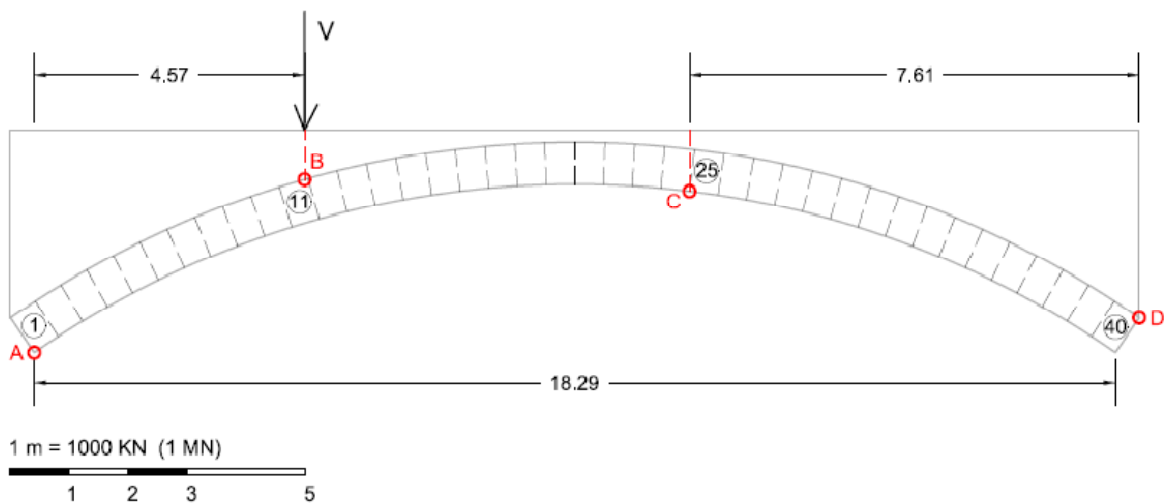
Bridgemill Bridge with location of the four hinges.
